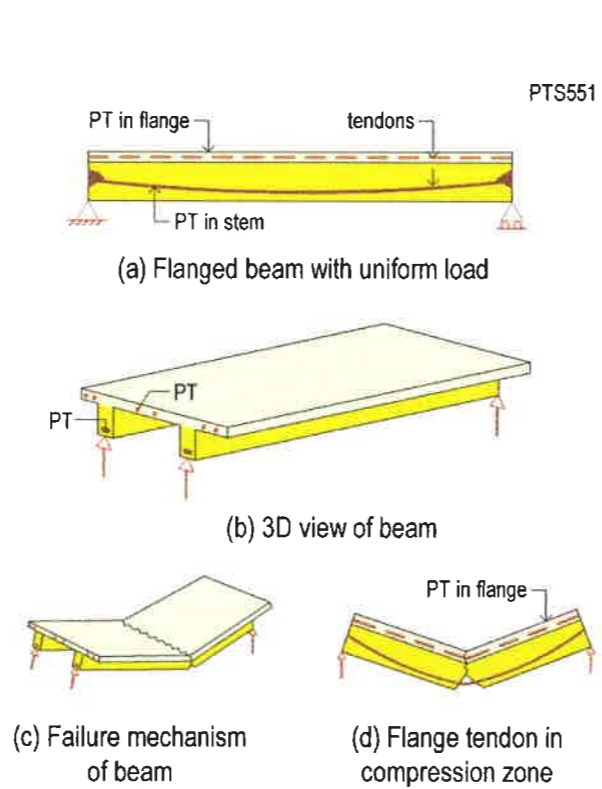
Flanged Beam with Tendon in Stem and Flange
